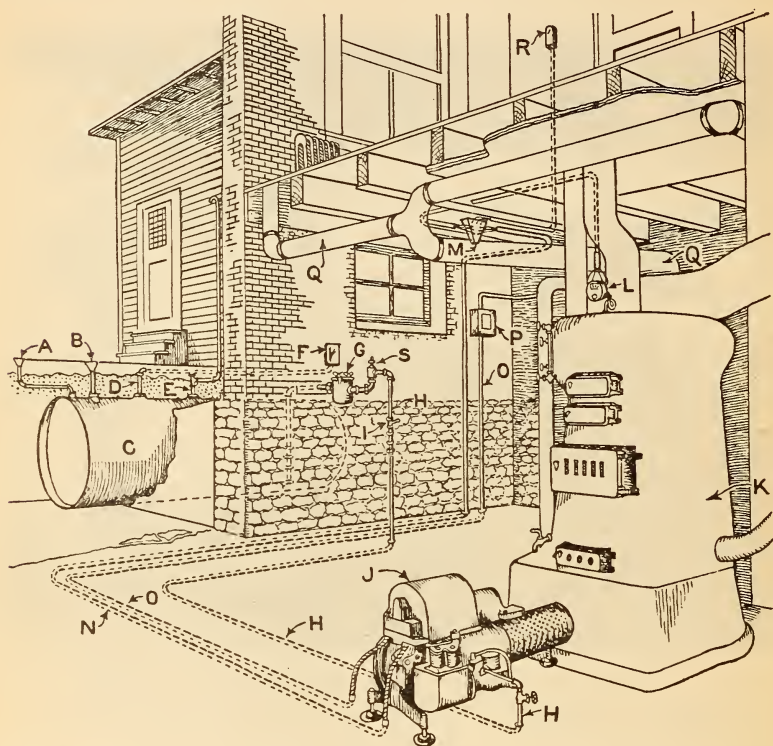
Complete automatic oil-burner installation. *a.* Filling box; *b.* Clean-out and measuring box; *c.* Underground storage tank; *d.* Tank-gauge tubing; *e.* Air vent; *f.* Tank gauge; *g.* Strainer; *h.* Oil feed pipe to burner; *i.* Globe or self-closing valve; *j.* Oil burner; *k.* Heating plant; *l.* Safety-control switch; *m.* Junction block; *n.* Thermostat wire to burner; *o.* Service wire to burner; *p.* Cut-out switch; *q.* Pipes to radiators; *r.* Room thermostat; *s.* Antisiphon valve
